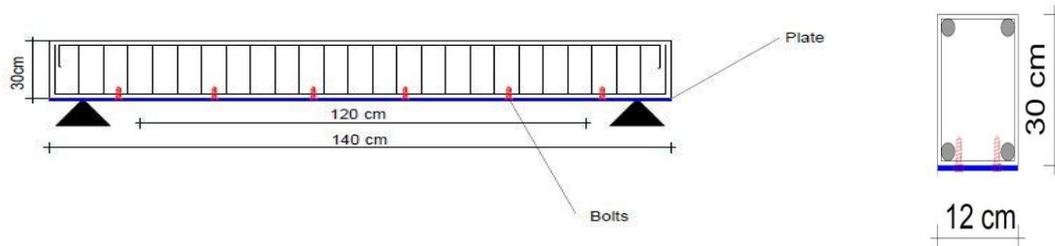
Longitudinal and mid span cross-section of strengthened specimen (B-SP)
